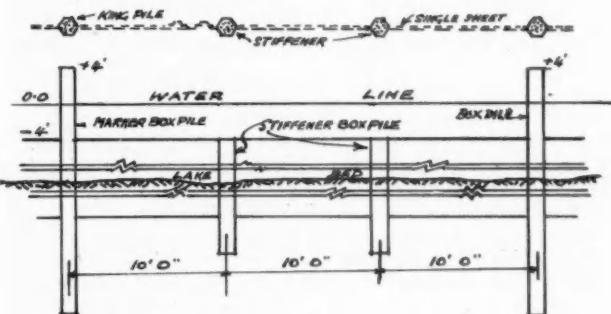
Details of M.S. Sheet piles of Submerged Dike.
